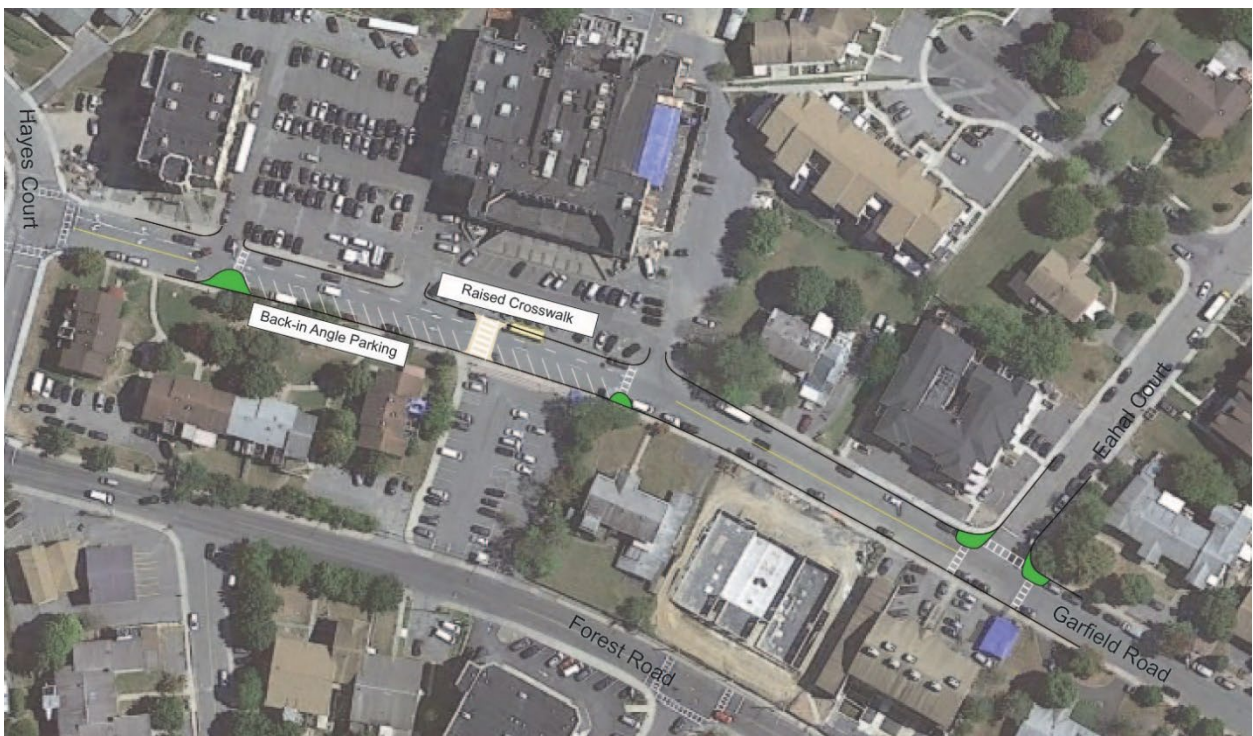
Garfield Road: One-way with Raised Crosswalk
